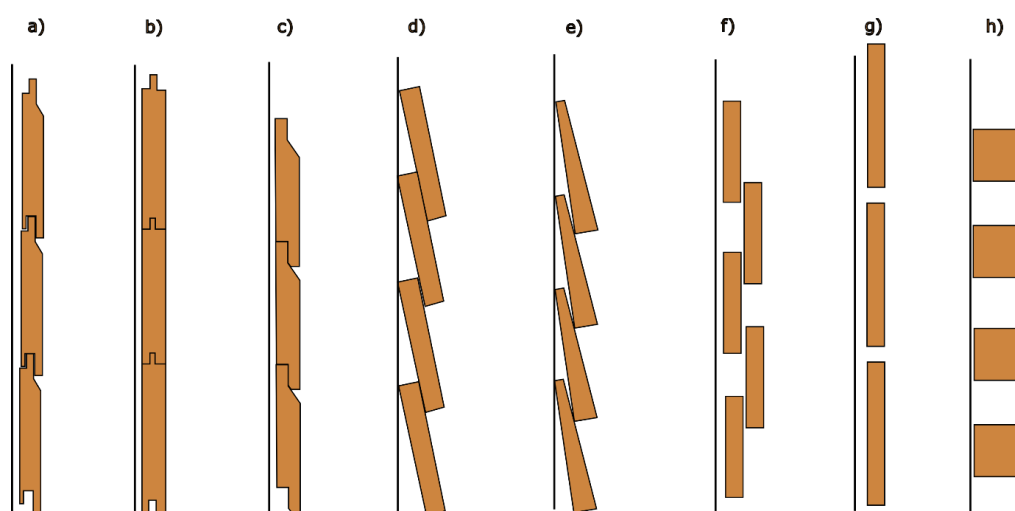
Typical wood cladding connection types: a) and b) tongue and groove c) shiplap d) square edge e) feather edge f) board-on-board g) open joint h) lamellae
